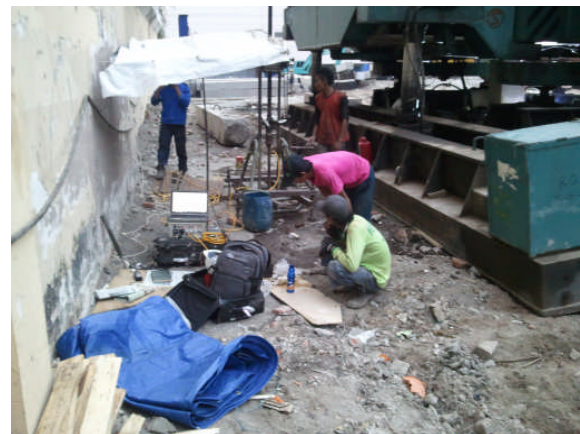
CPTu Testing Near Hydraulic Pile Driver
